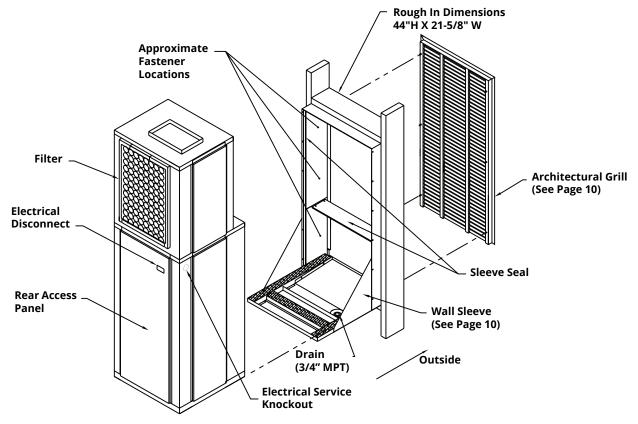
General Assembly for Standard Sleeve and Grill
